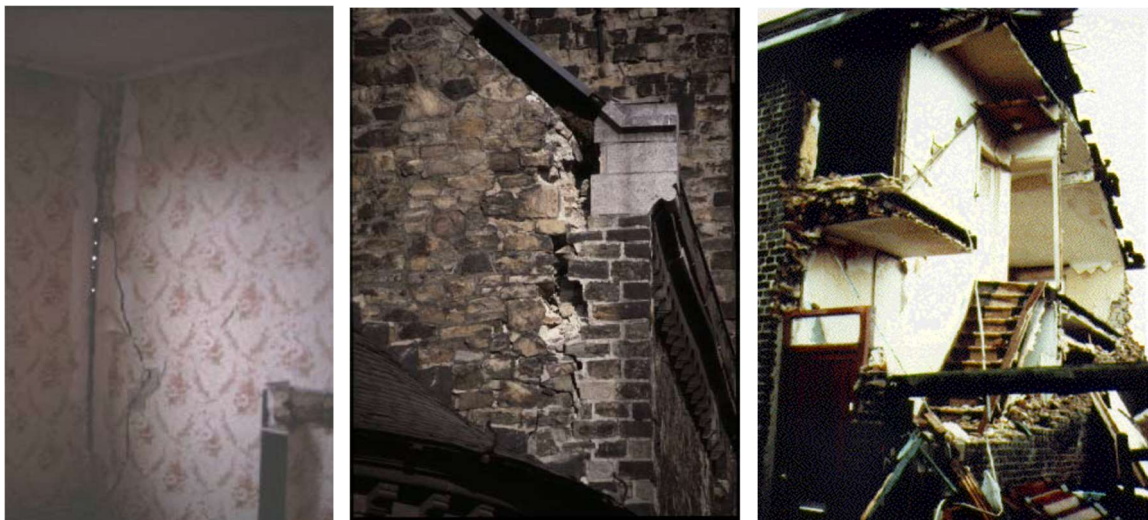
Crack at the angle of the walls (left), severe cracking between two walls at the church St Gilles (centre), and collapse of the external wall façade (right). From Doneux *et al.* (2003).
